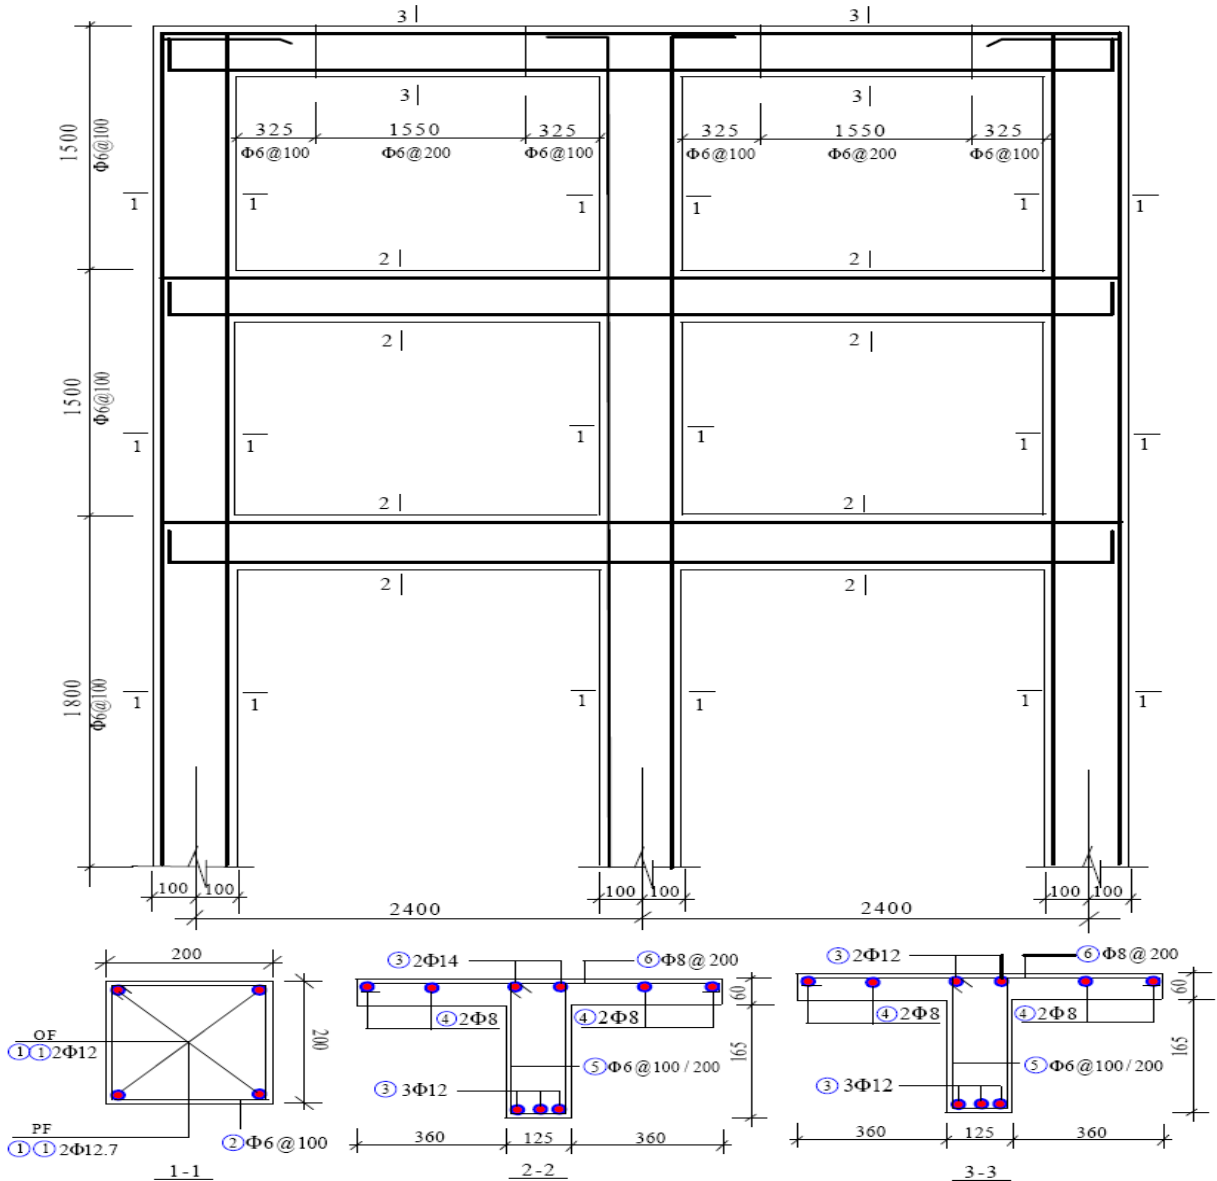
Frames geometric along with longitudinal and cross-sectional reinforcement details
